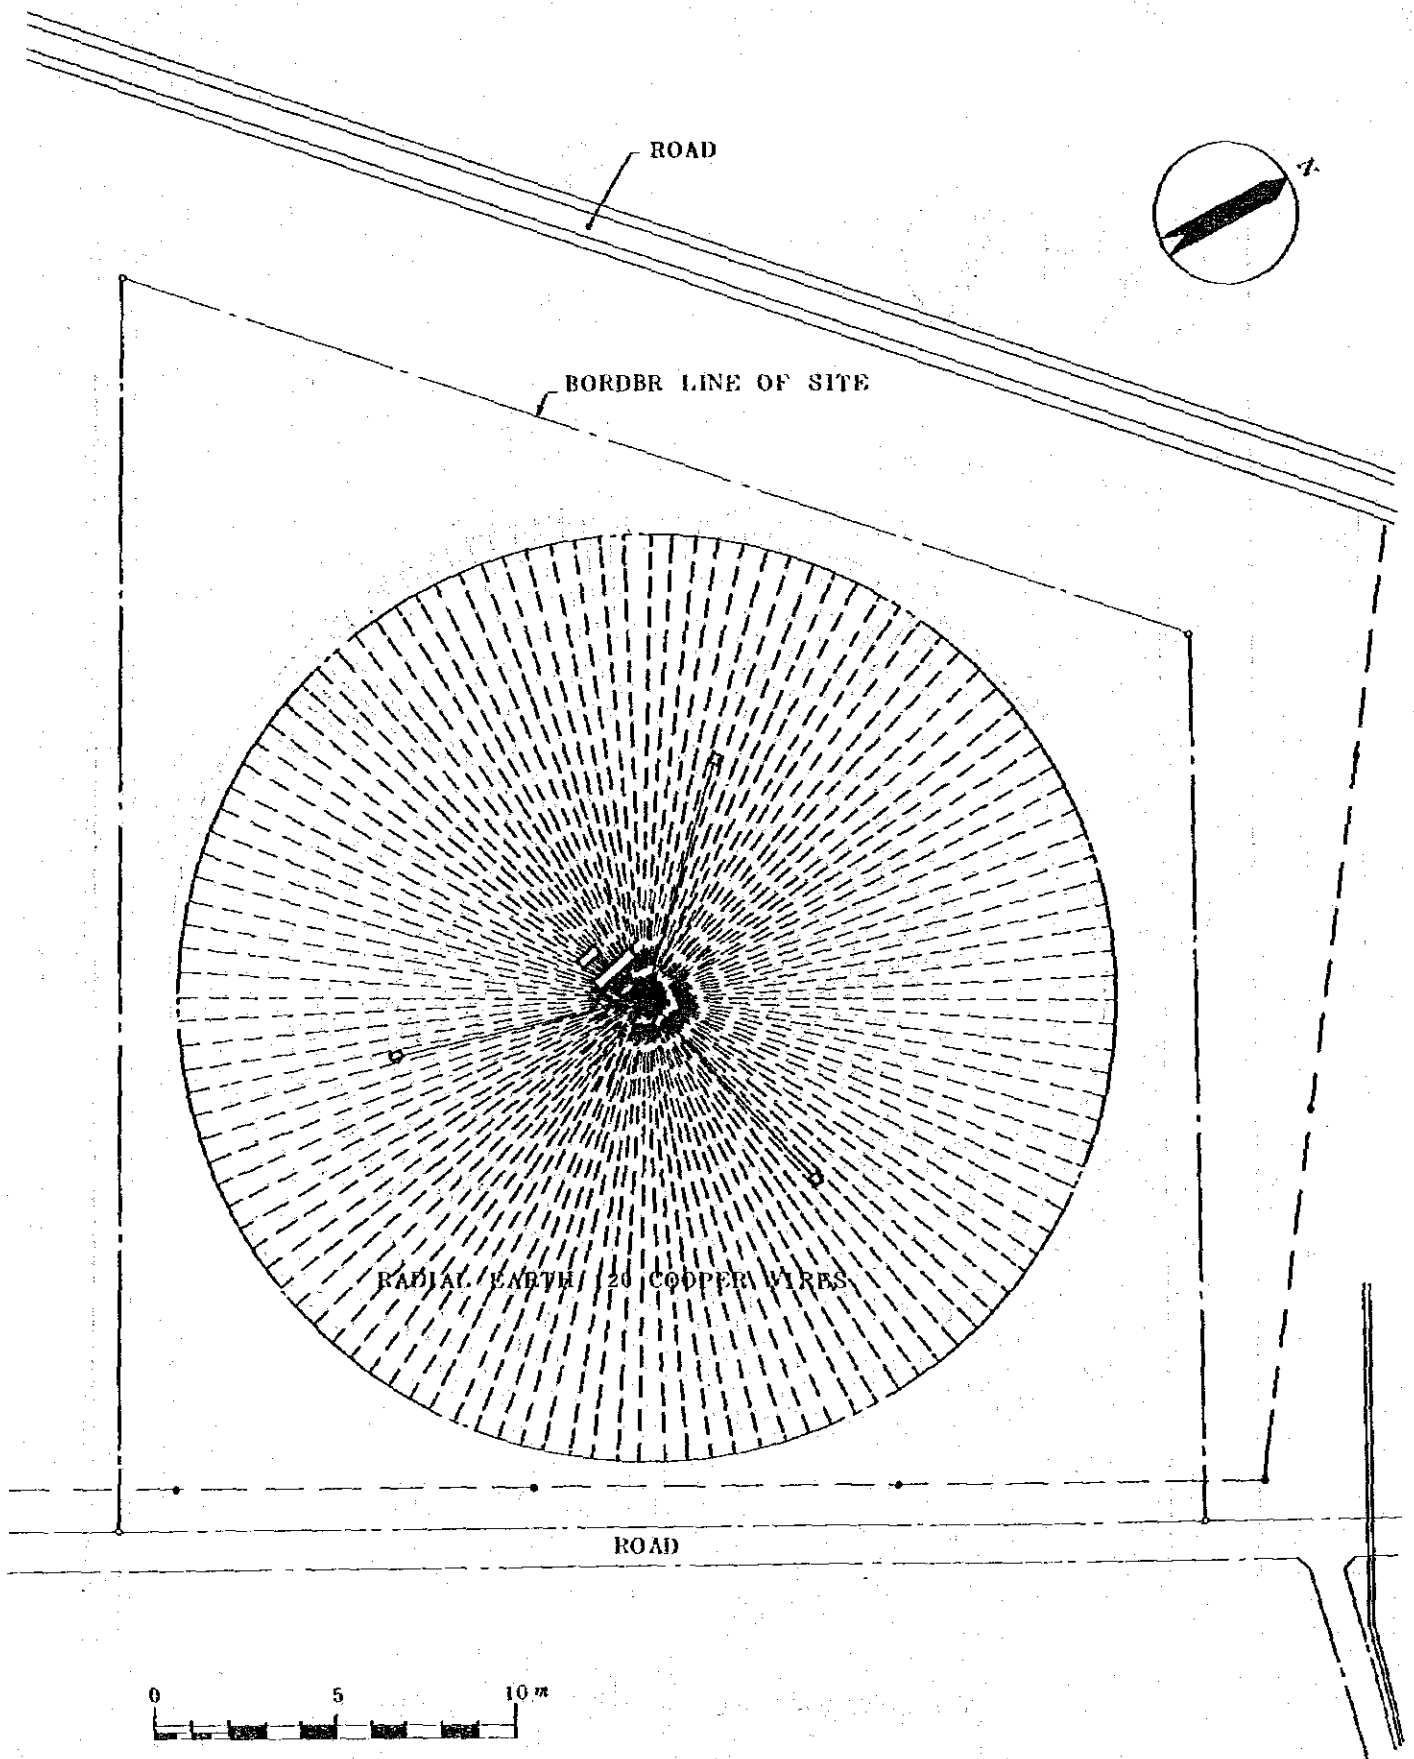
Layout of Tower and Earth of Kassala
